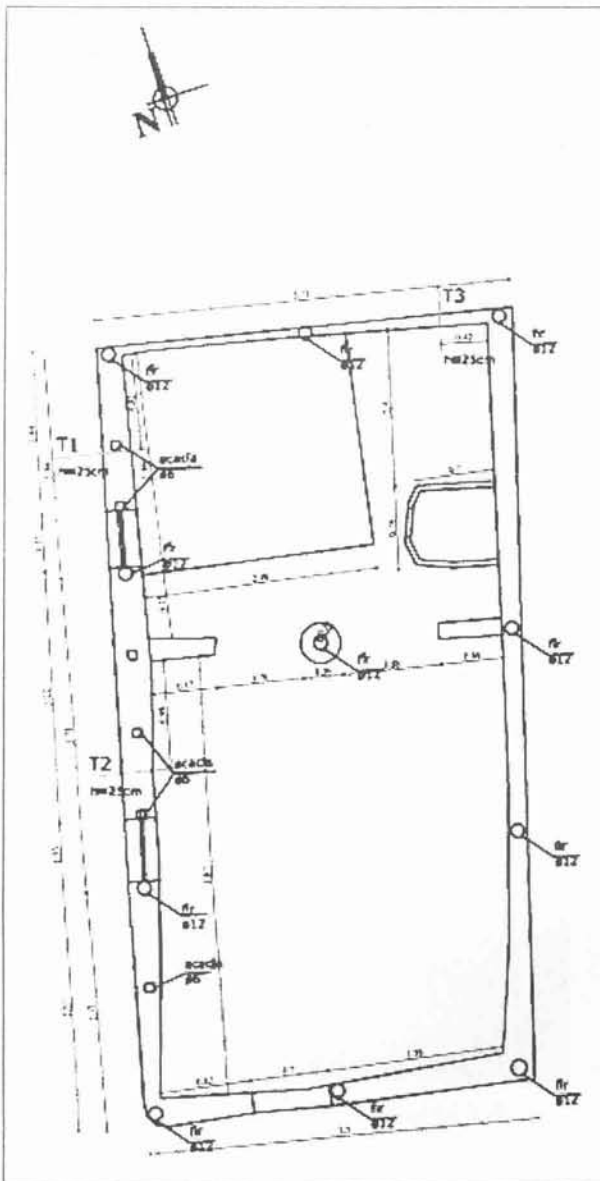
Plan of the fired house (arch. Oana Parau and Dr. Fabio Cavulli). T= thermocouple.
